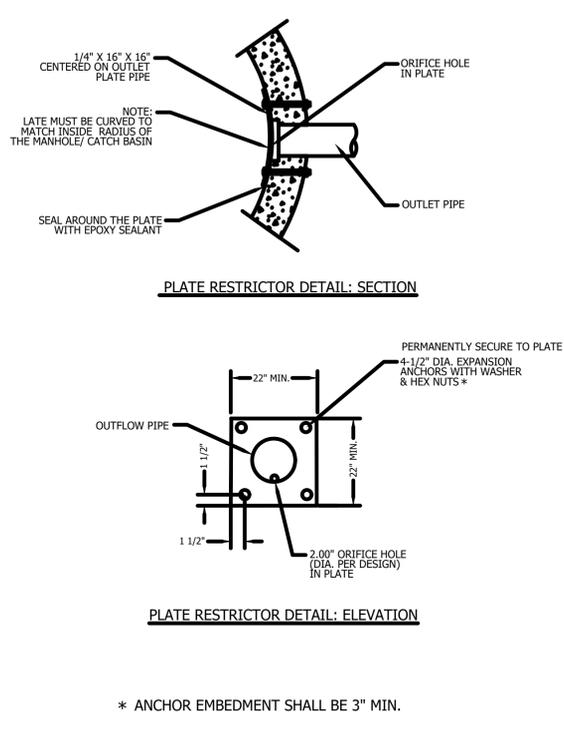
PLATE RESTRICTOR DETAIL: SECTION and ELEVATION
